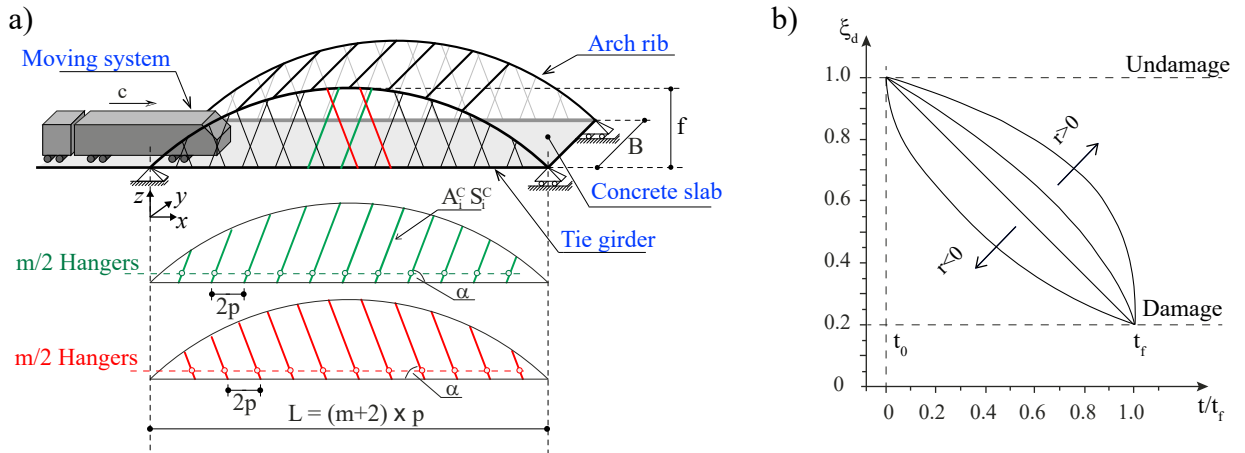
(a) Structural scheme of the network arch bridge; (b) Damage law for cable element
